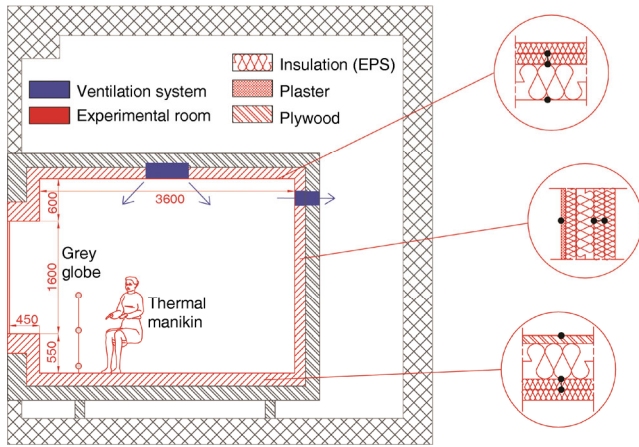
Vertical section of “The Cube” (dimensions in mm) with details on the construction elements (black dots indicate thermocouples)
